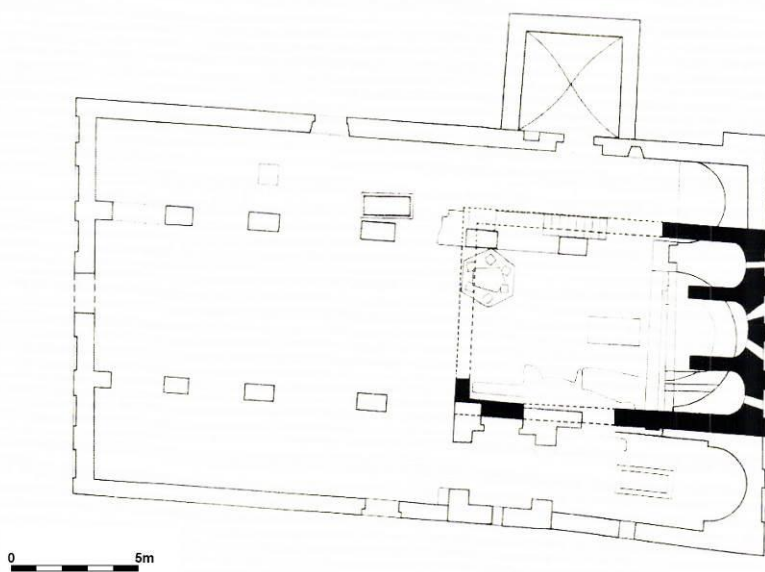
Floor plan of the church of St Sofia, Dvigrad
